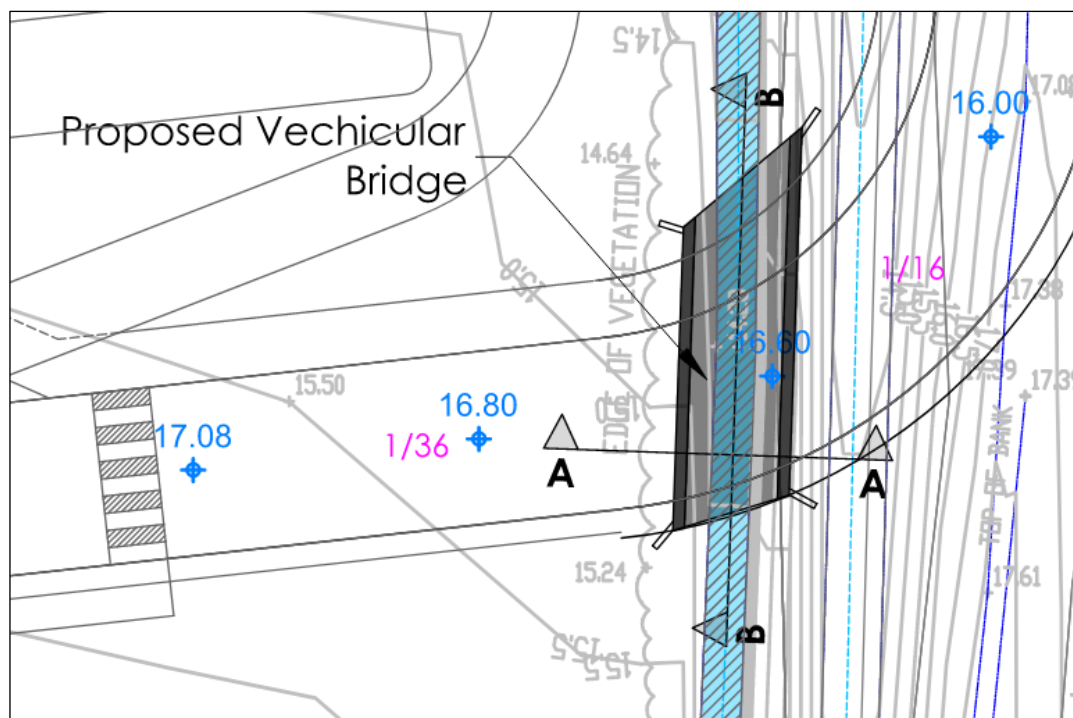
Proposed Plan of Bridge (Extract from DOSA drawing 5958-0013)
